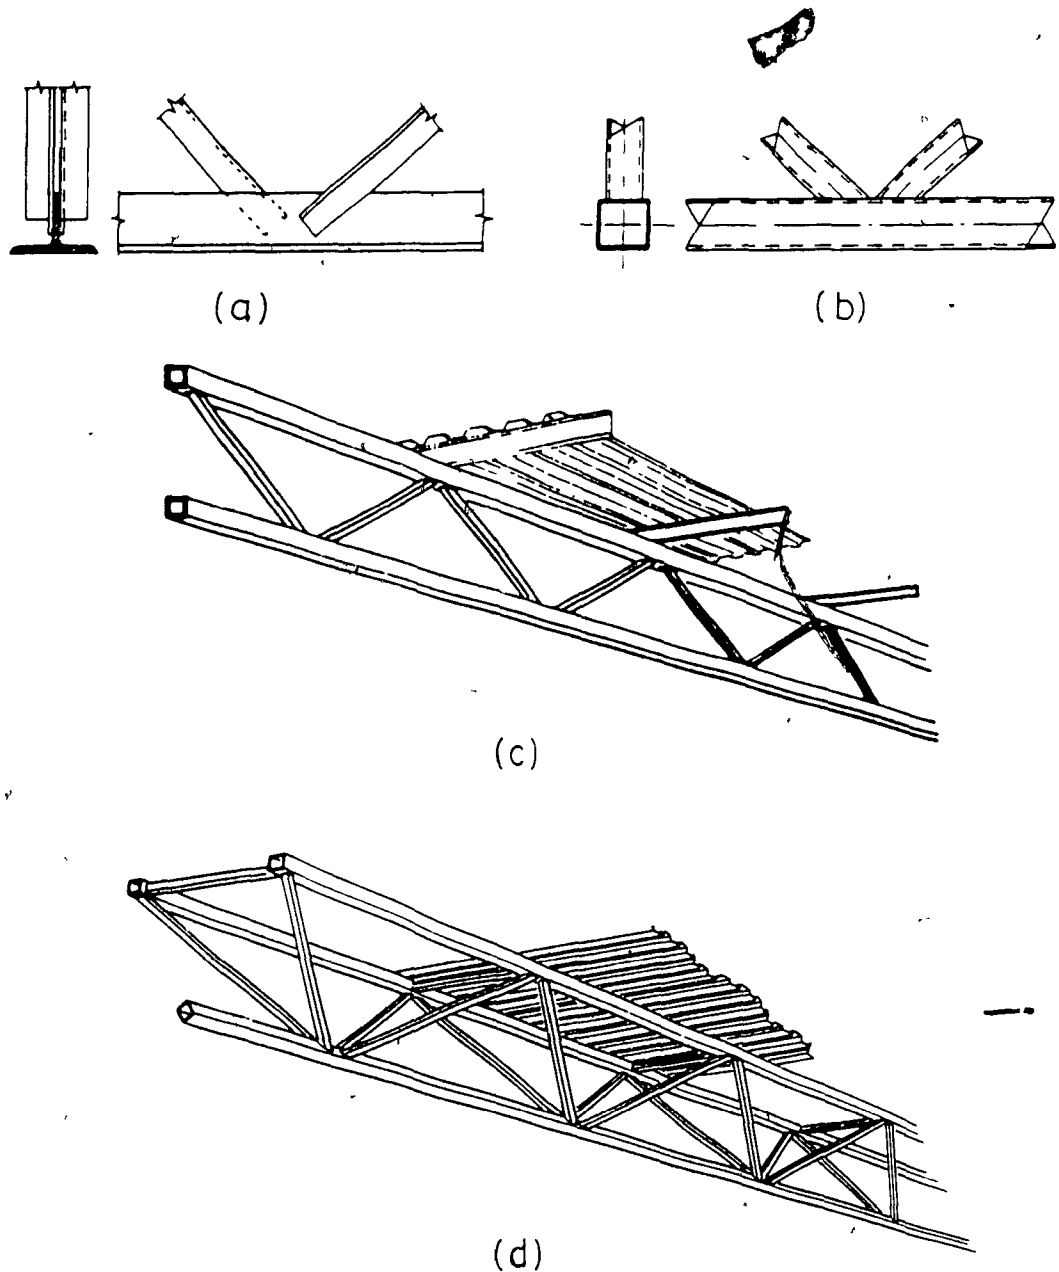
Truss details and HSS trusses (a) Open section detail (b) Hollow section detail. (c) Plane truss. (d) Triangular truss
